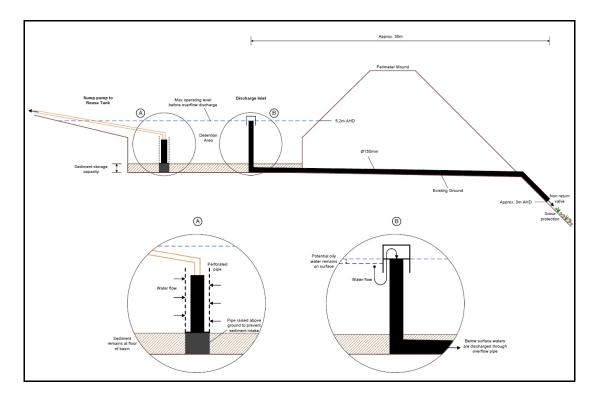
General Arrangement for Stormwater Collection Sumps.
